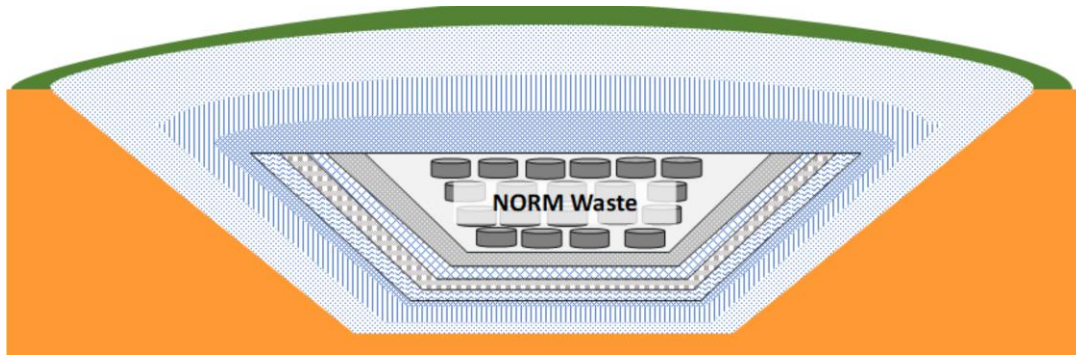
Example illustration of a landfill disposal facility with engineered near surface features (AELB, 2020)
